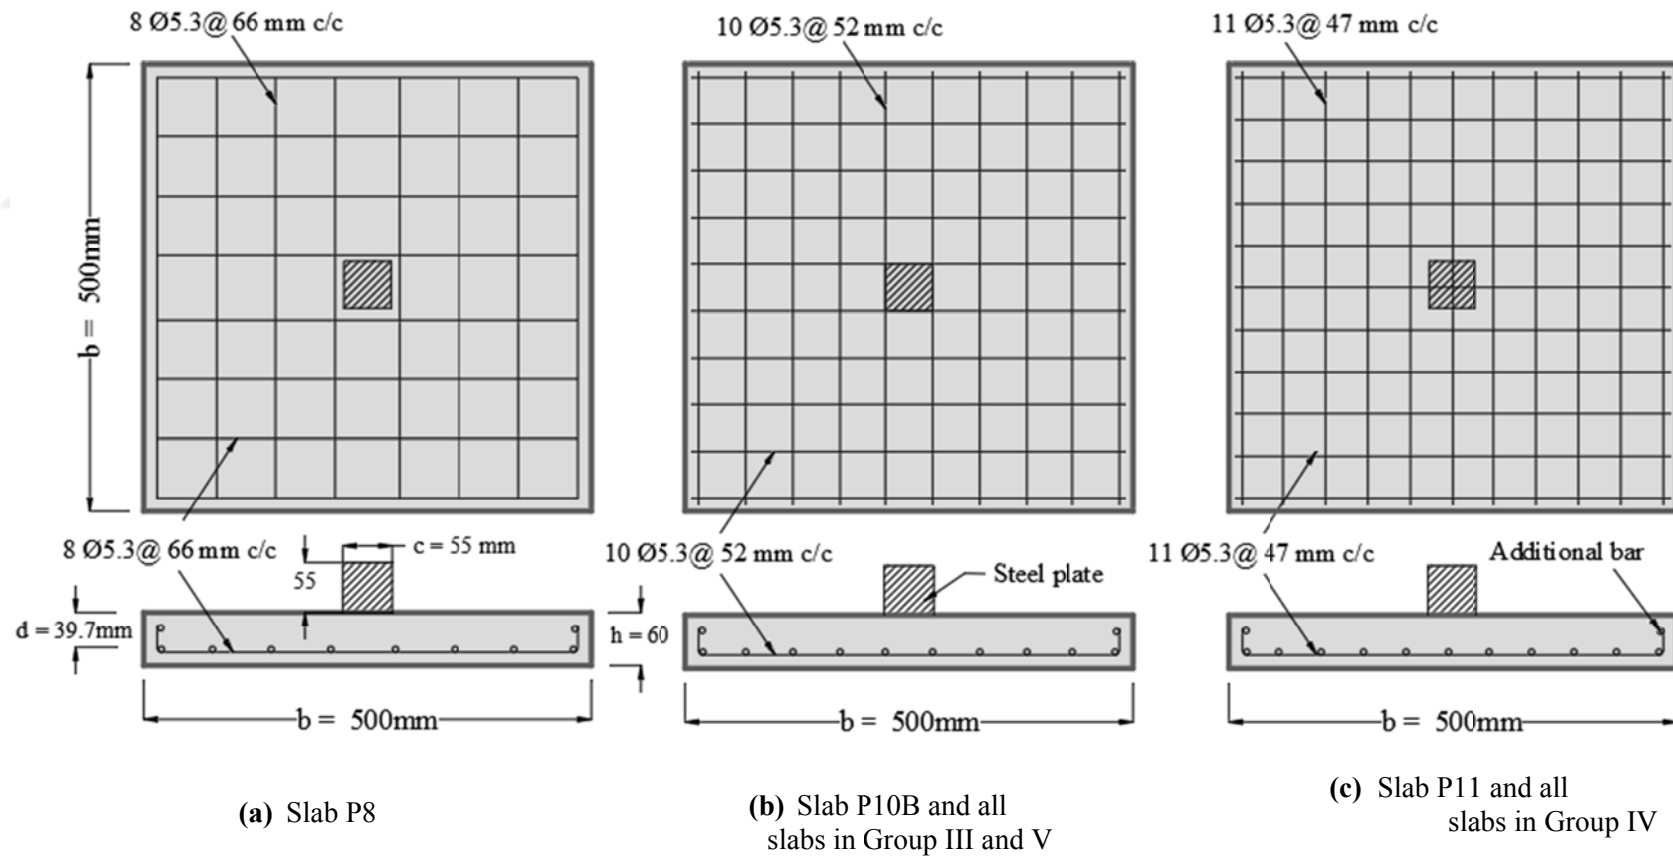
Typical geometry and reinforcement details for slabs of Group 1, 2, and 3
